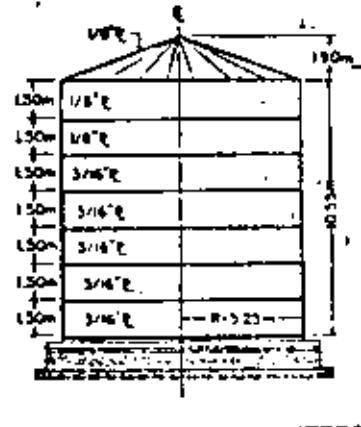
DETAILS OF FOUNDATION AND ANCHORAGE OF TANKS SHOWN
